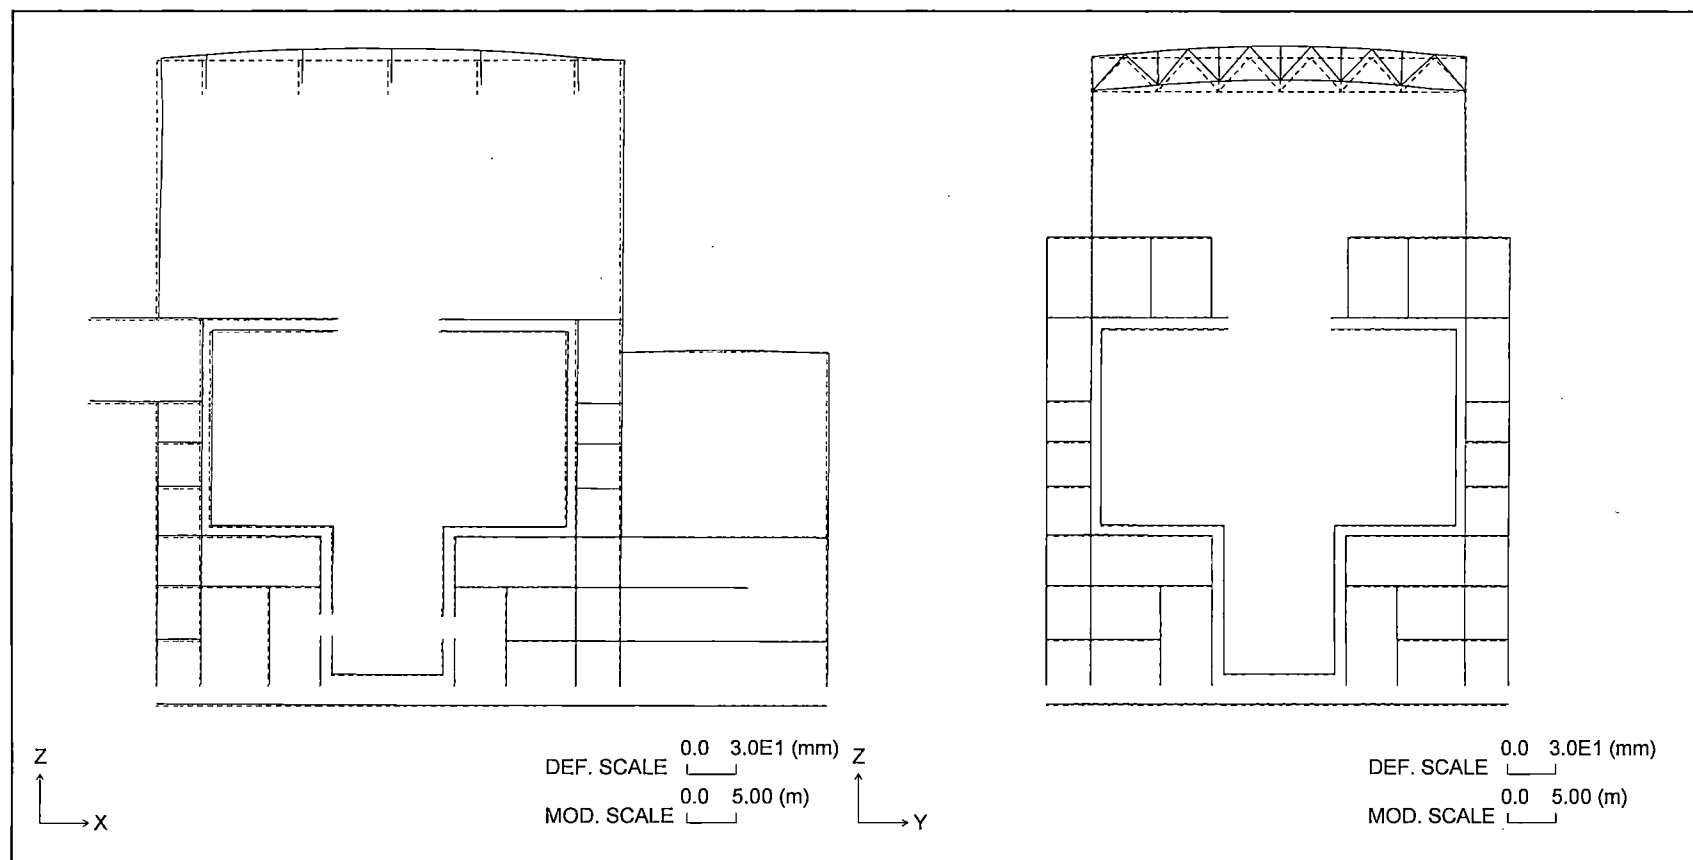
Section Deformation for Wind Load (North Wind)
